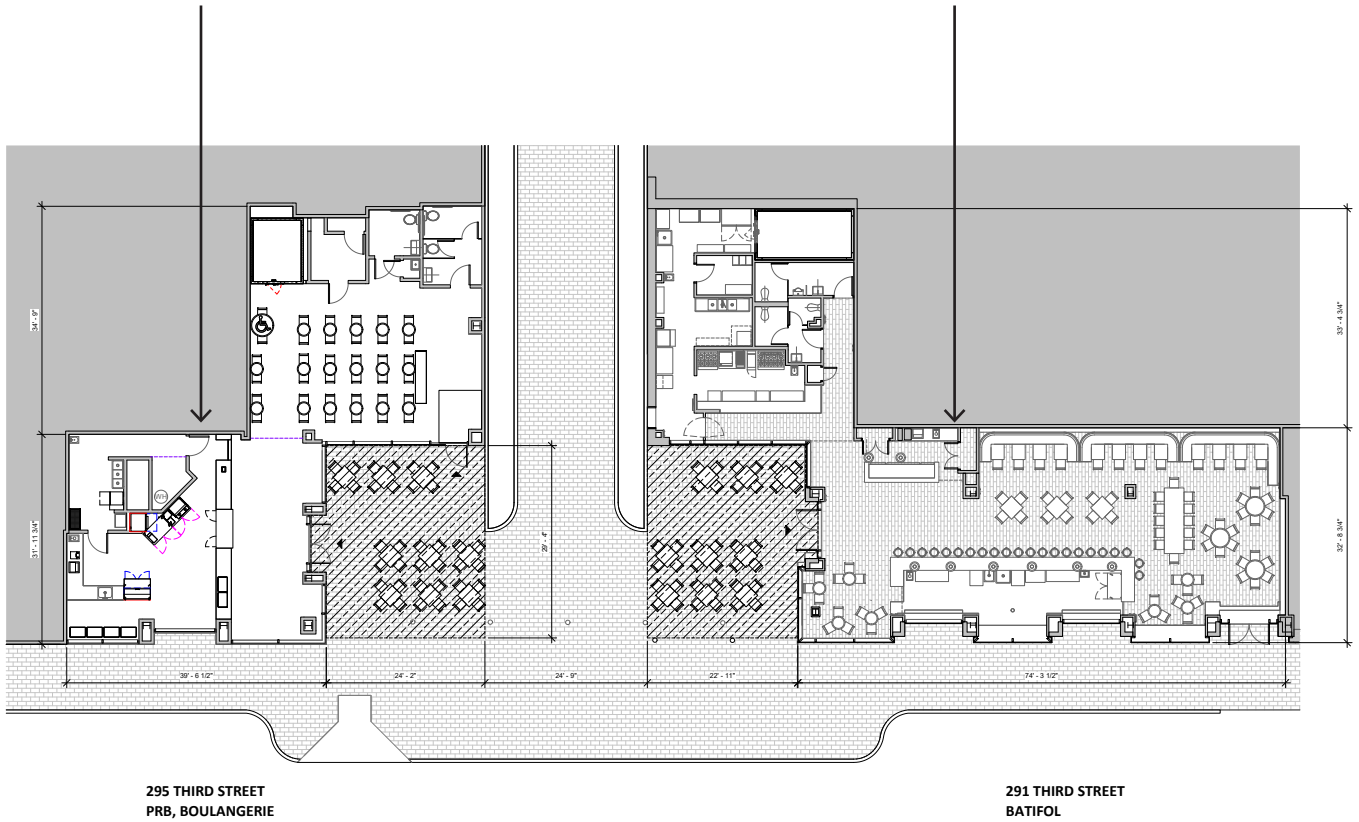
PRB | BOULANGERIE AND BATIFOL LAYOUT
